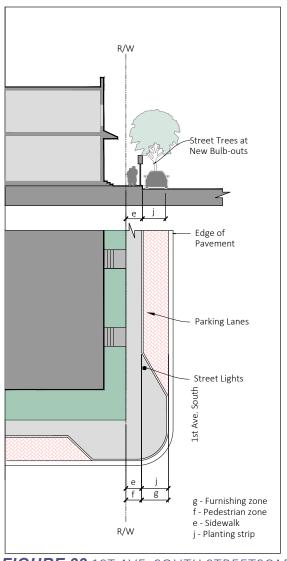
1ST AVE. SOUTH STREETSCAPE
